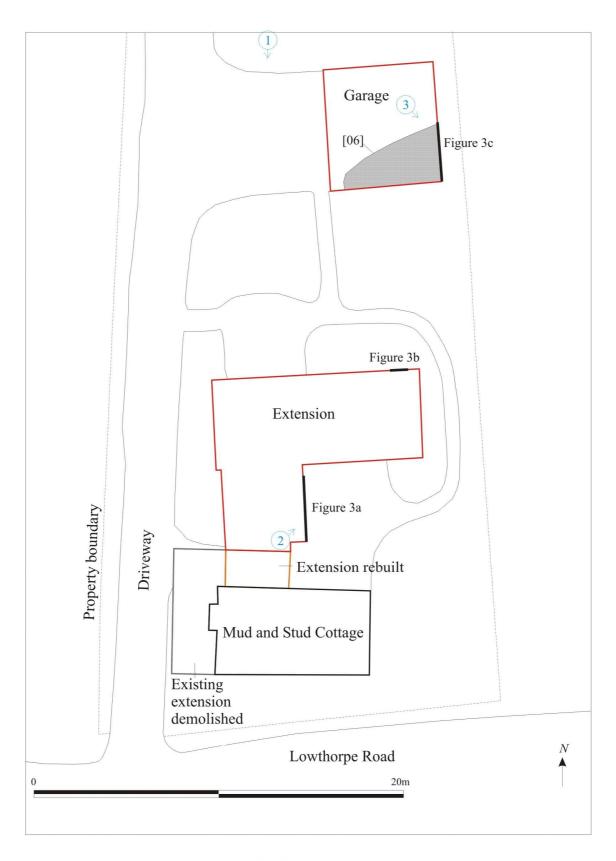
Site plan showing extent of building works and location of sections and plates. Shaded grey area denotes archaeological features. Blue circled numbers represent colour plates (see Appendix C) with arrows indicating direction taken. At scale 1:200
